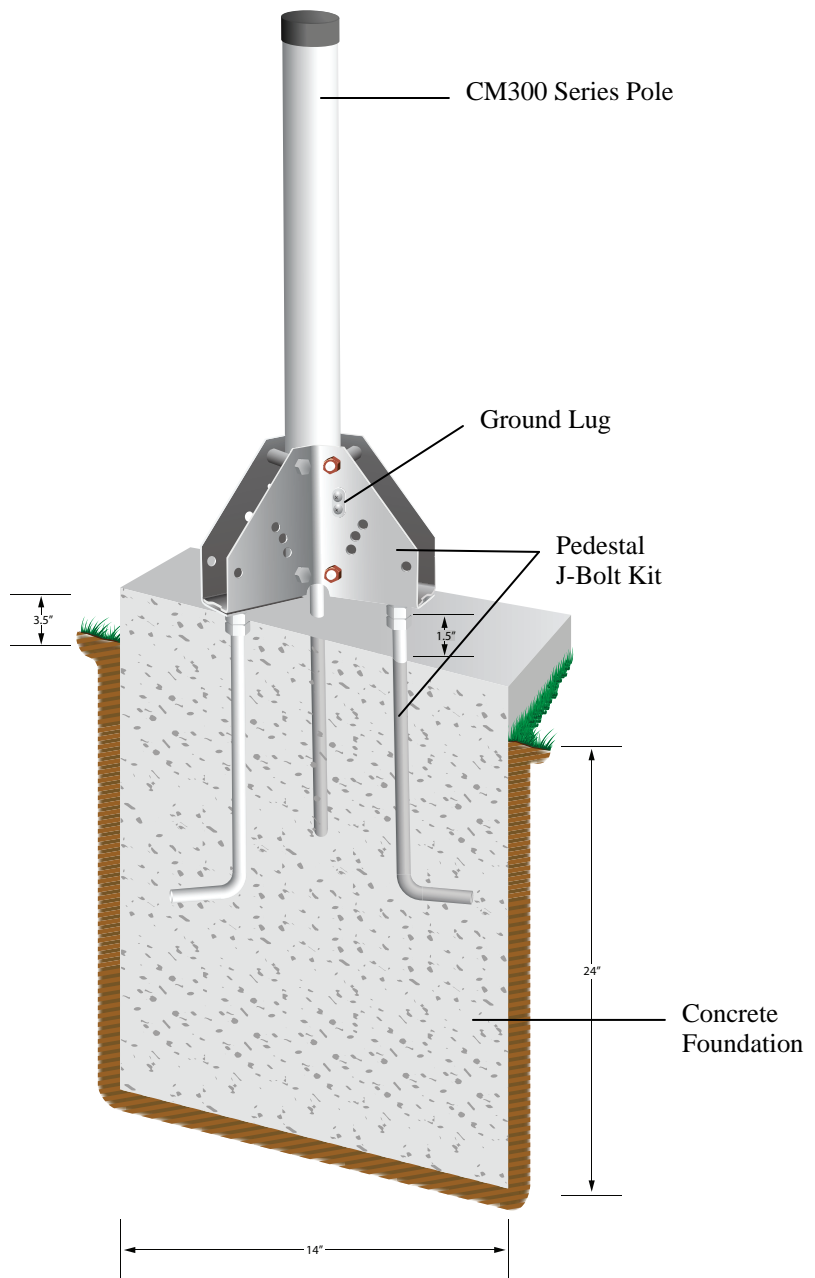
CM305 Mounting Pole with Pedestal J-Bolt Kit
